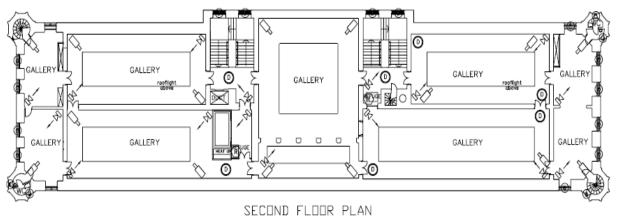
Second Floor Plan (Source: Page\Park Architects)
